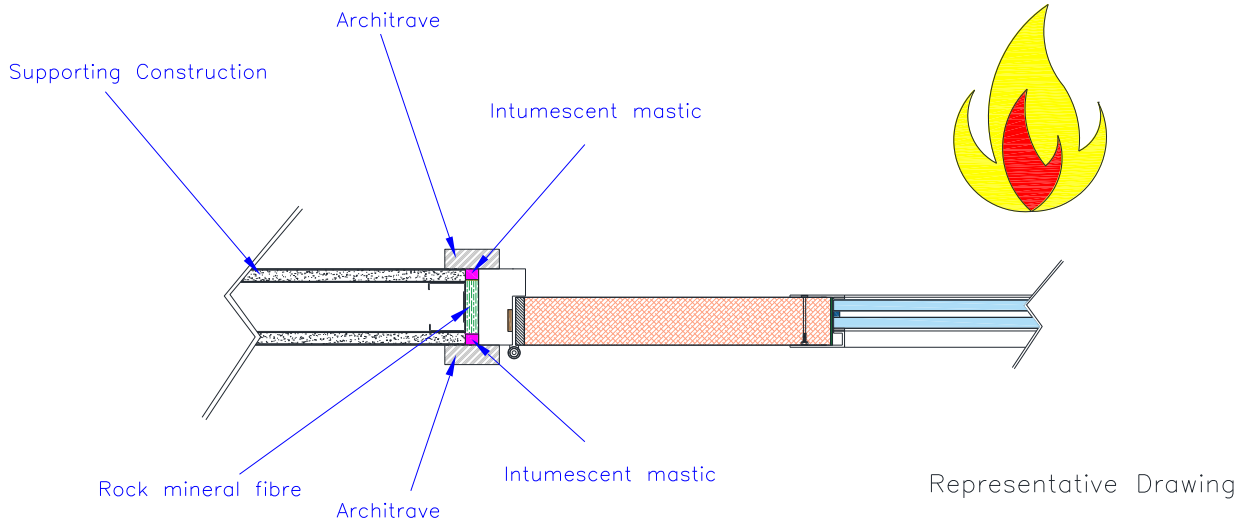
Details of Supporting Construction to Frame, Fire Stopping – Doorset A
